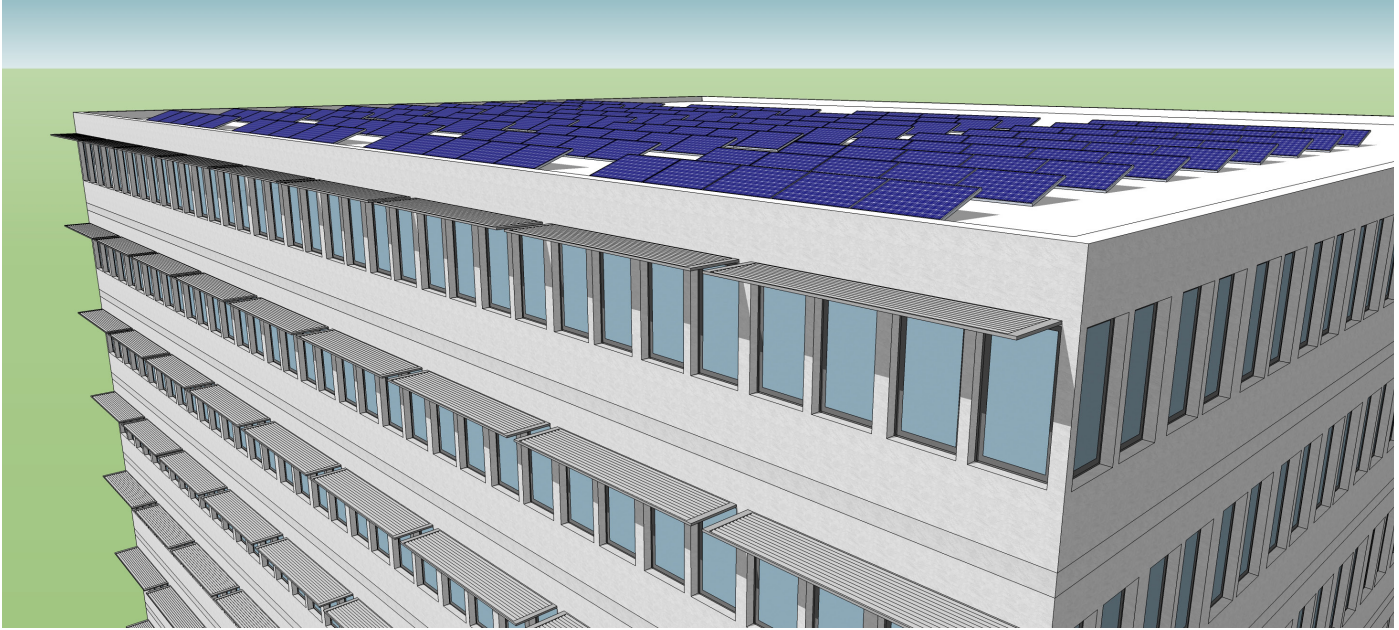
Upper floors of 2050 High Rise Masonry Commercial building, showing sun shades.
